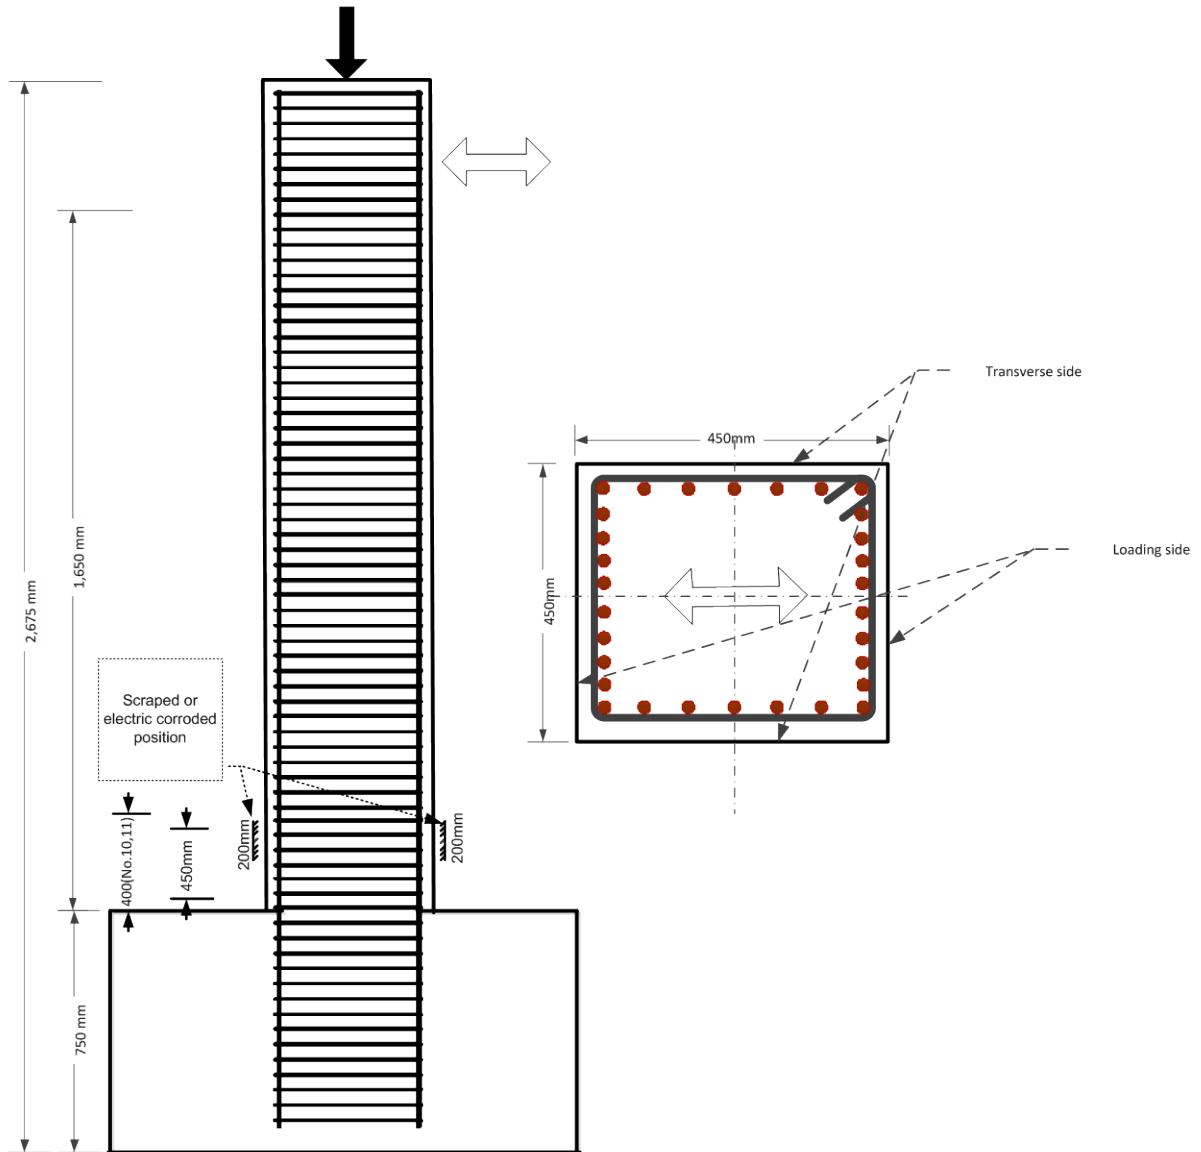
Case study verification: specimen details (Oyado et al. 2007).
